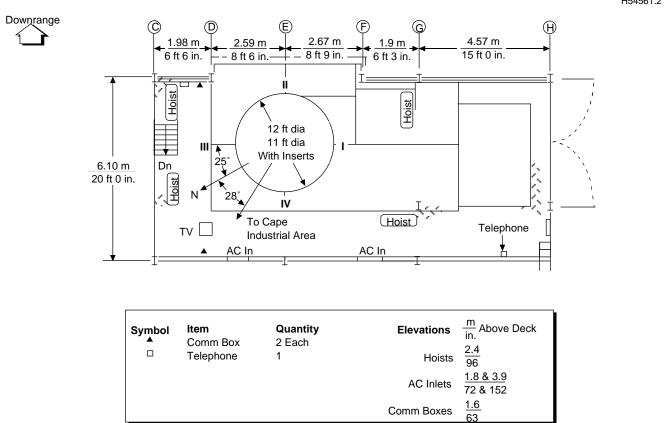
Level 9C Floor Plan, Pads 17A and 17B
